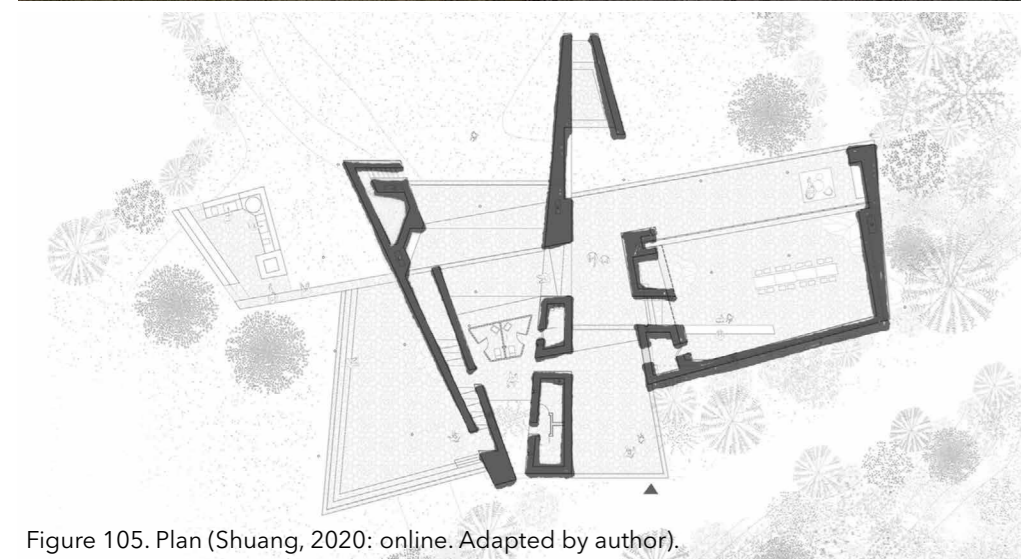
Plan (Shuang, 2020: online. Adapted by author).
